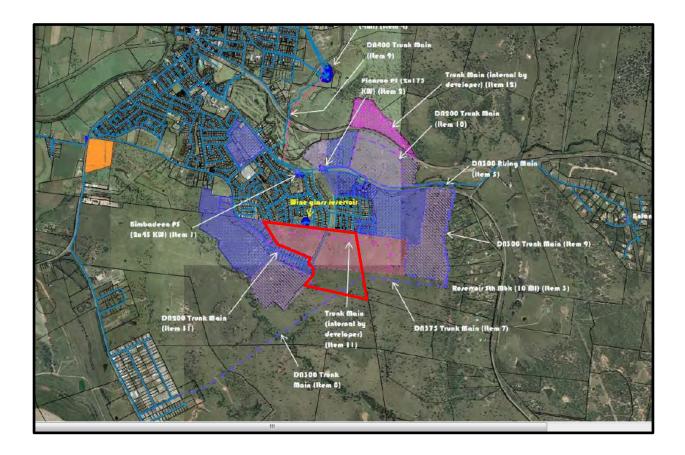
Extract from MSC Developer Servicing Plan – Water
